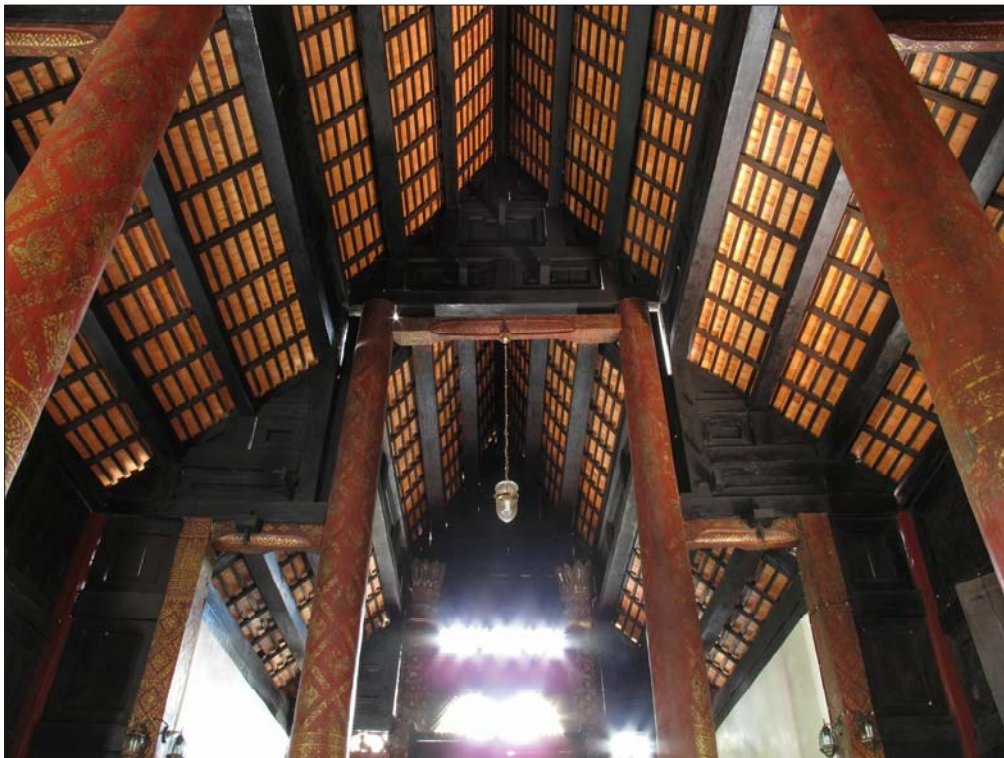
Connection of purlin from the first bay meeting the second transverse frame
